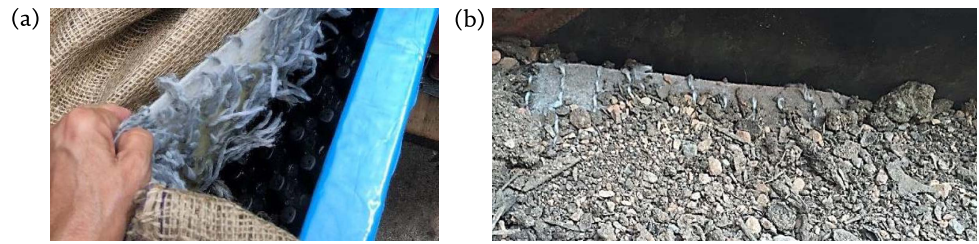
(a) A commercial patented wicking fabric [12] for drawing moisture from the water reservoir upward for plants and/or evaporation through the layers above. (b) The wicking fabric can be placed under a drainage layer or ballast layer such as the gravel shown here for green, blue and blue-green roofs.
